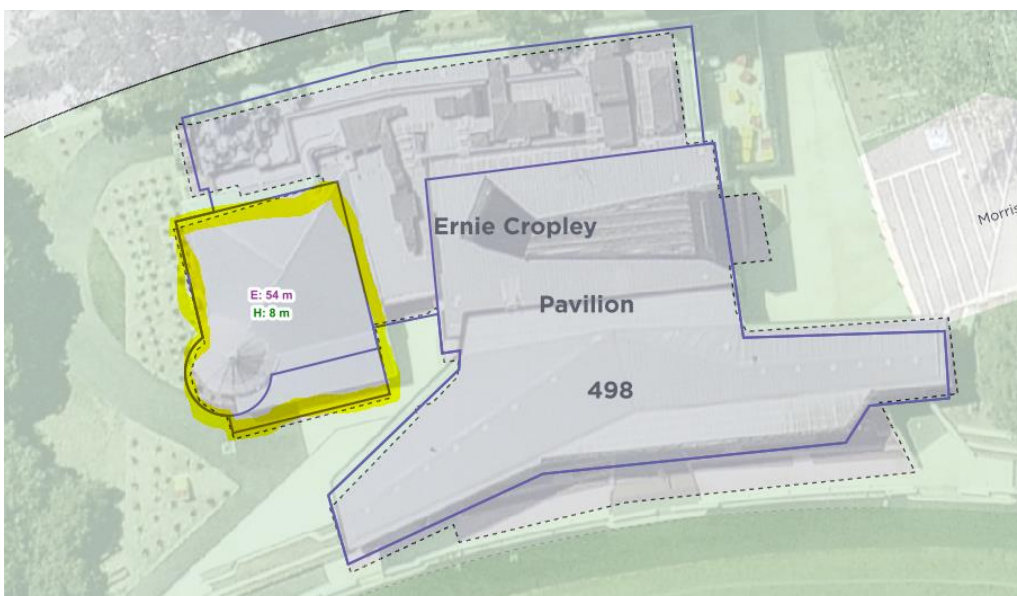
Heritage fabric at the Pavilion shown highlighted (CoMPASS, and Roof Plan submitted with planning application, Cox Architects, September 2012)
